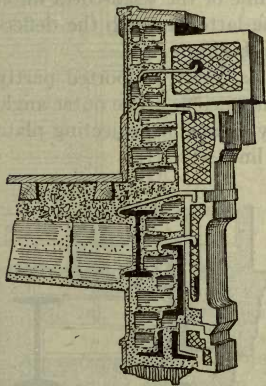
Spandrel Section, 16th Floor, Broadway Chambers, N. Y.
